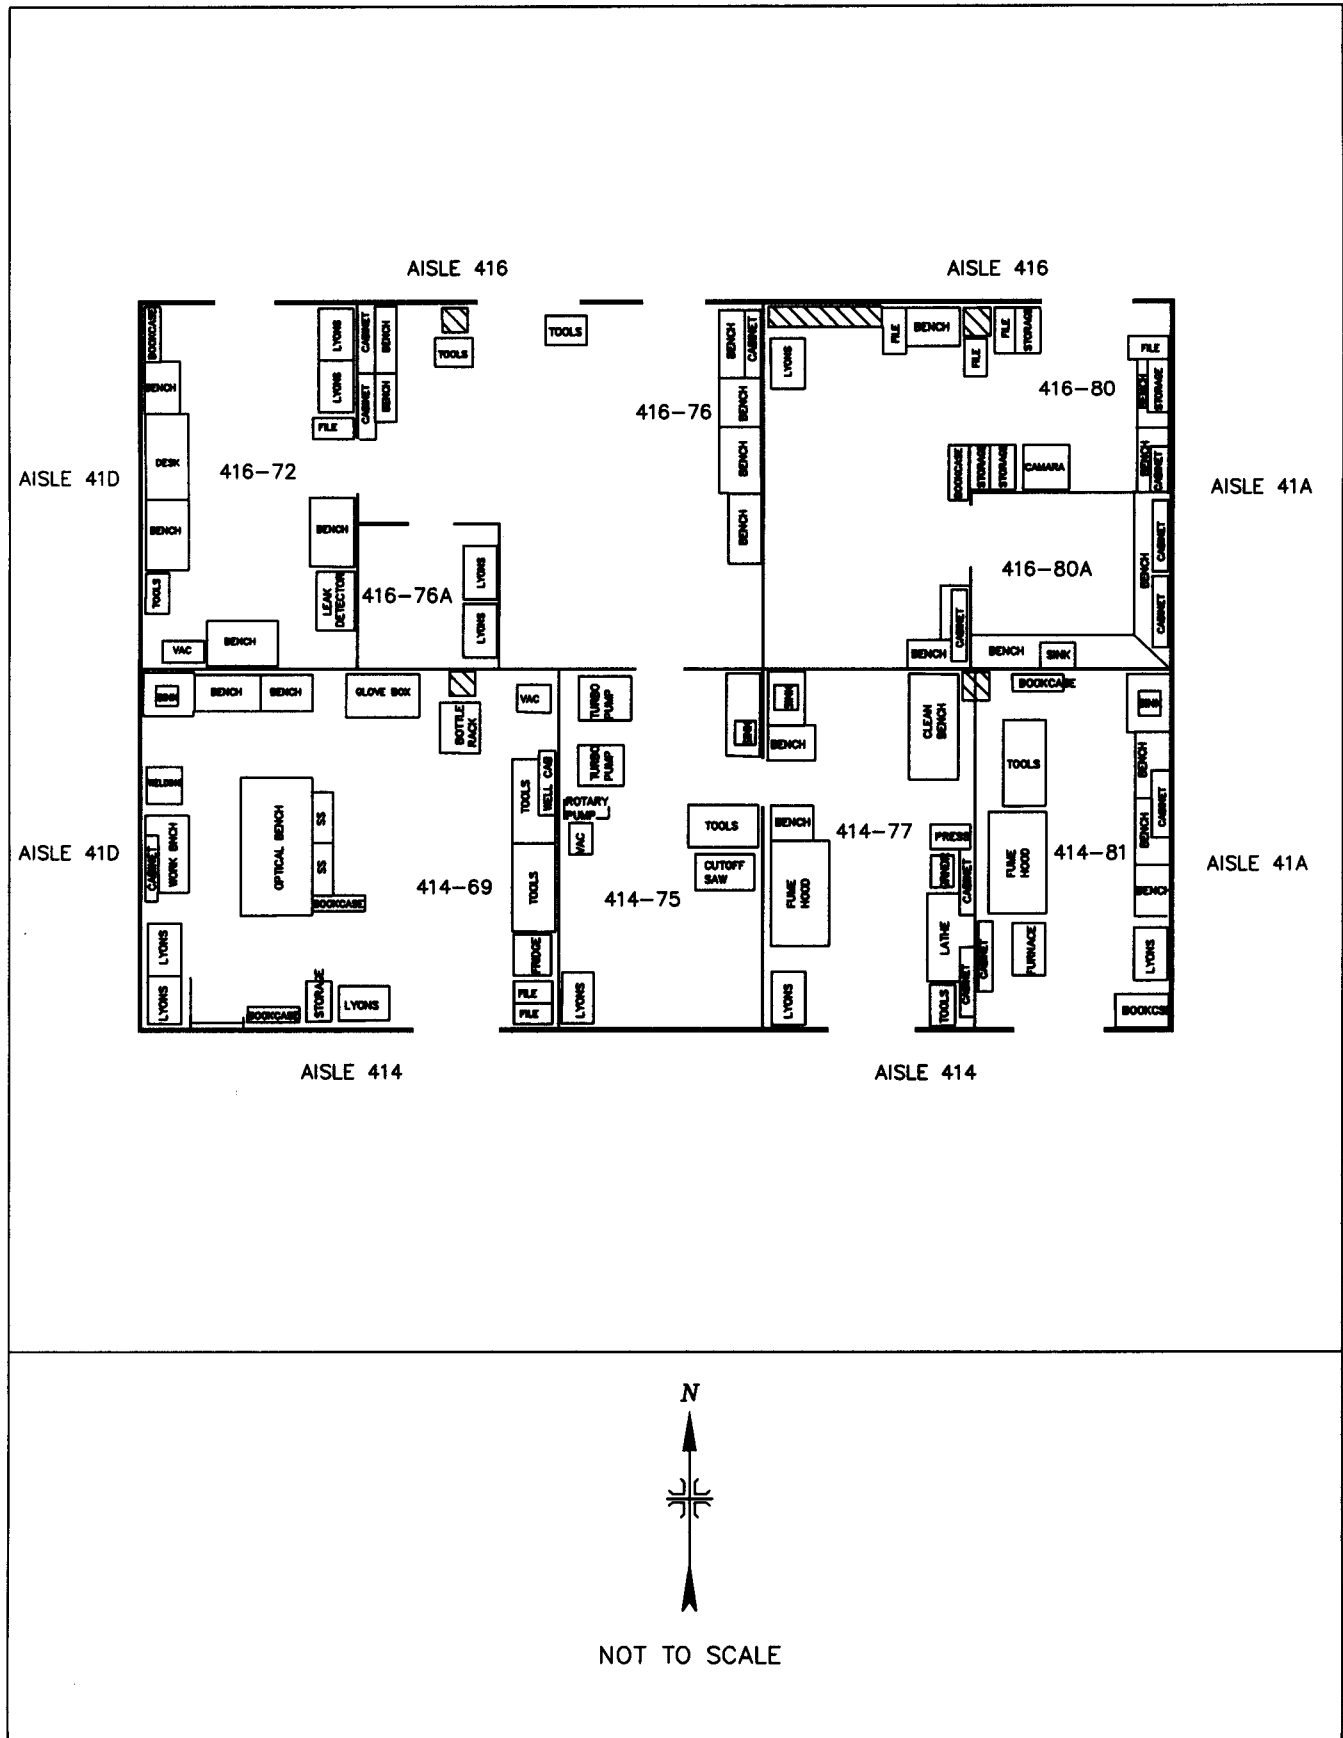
Mass Spectroscopy Laboratory – Original Floor Plan
